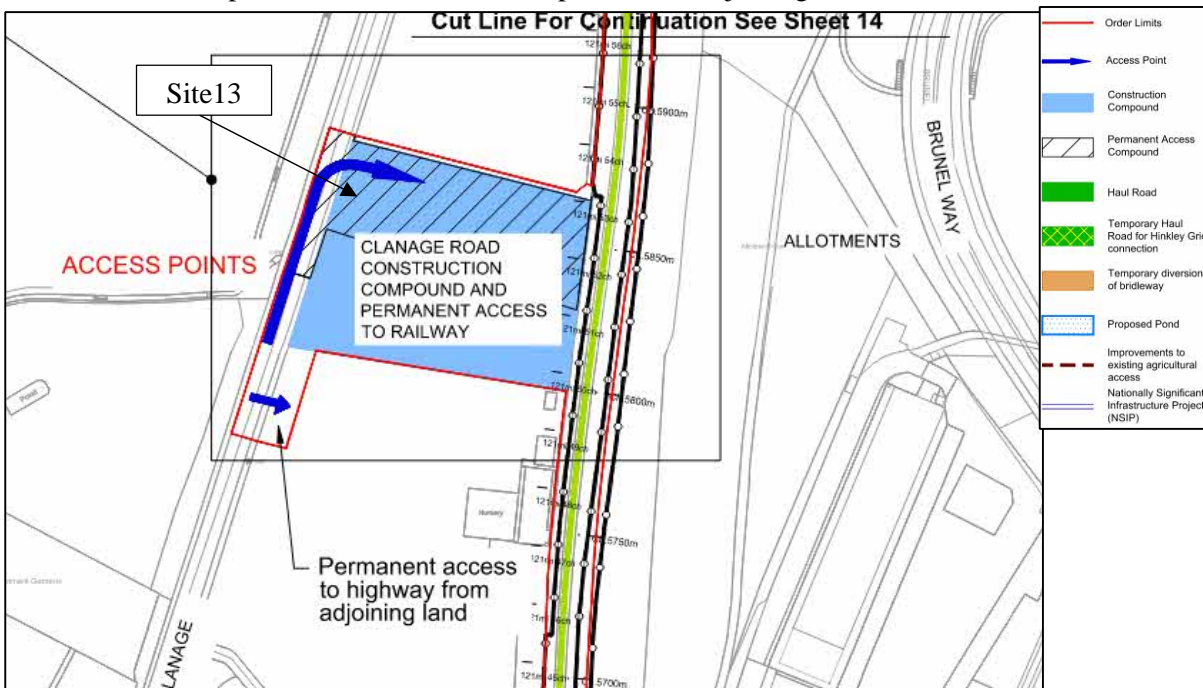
Proposed works for Clanage Road (Site 13) [3].
